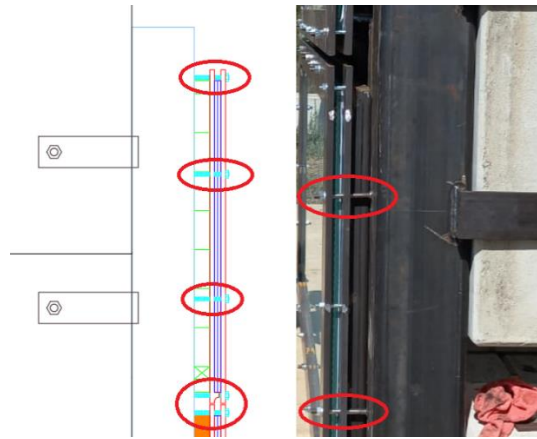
M12 Threaded Bolts Supporting the Glass Panel
